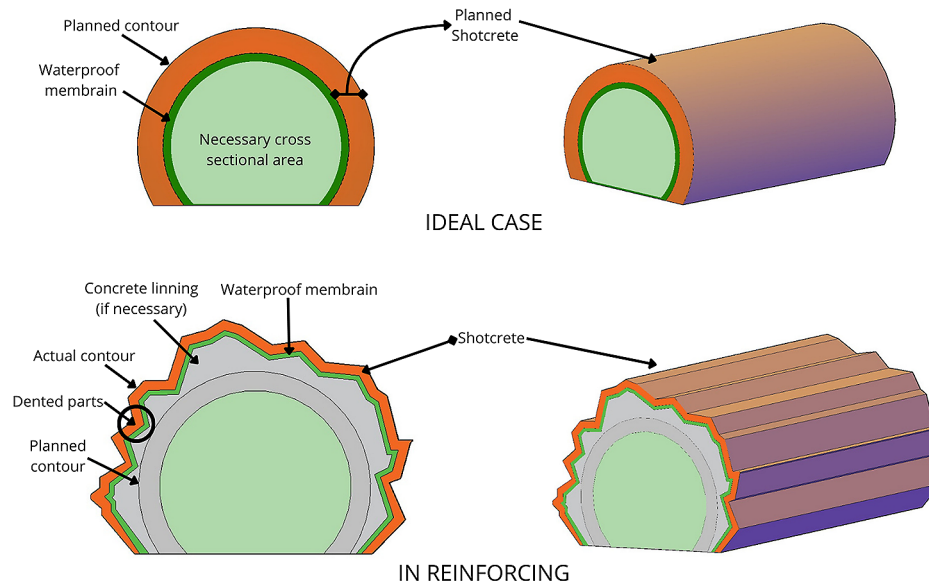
Necessary cross section area, planned contour, waterproof membrane and shotcrete in details. (Kim and Bruland, 2015)
